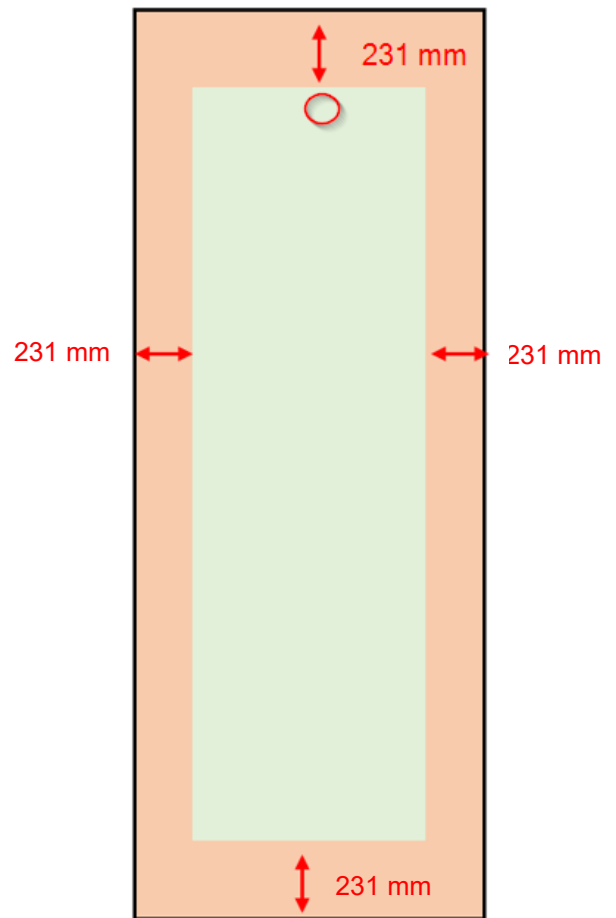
Distance of access port positions from the edge of the wall/ceiling element
